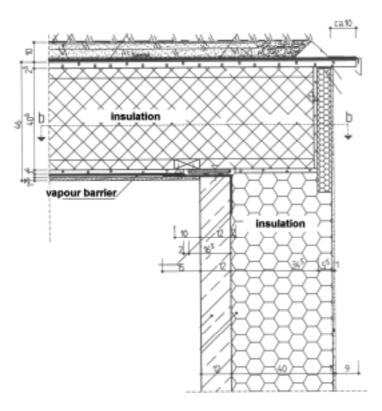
Thermal-bridge-free junction with the gable wall's thermal compound insulation system against the lightweight roof element
